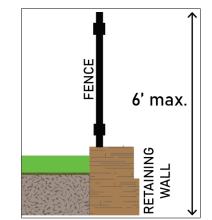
A-2-E-2-I: Requirement for fence location when retaining wall is not adjacent to walkway.
